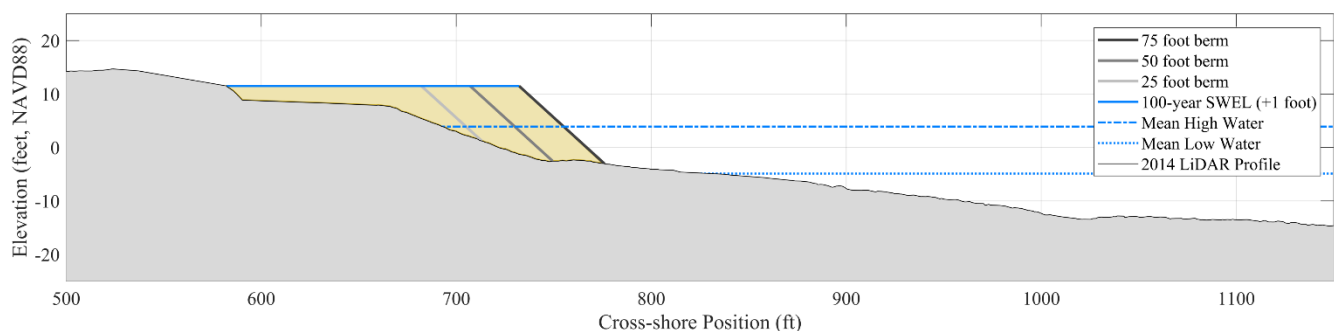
Profile view of each nourishment alternative (75, 50, and 25-foot berms). Each berm is designed to an elevation of 11 feet NAVD88, or one foot above the FEMA 100 year still water elevation. Properties along the shoreline sit at an elevation at or above 15 feet NAVD88.
